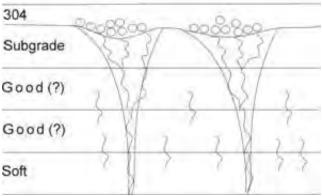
F - Stage 3 Hauling, Grading, and Placing 304
